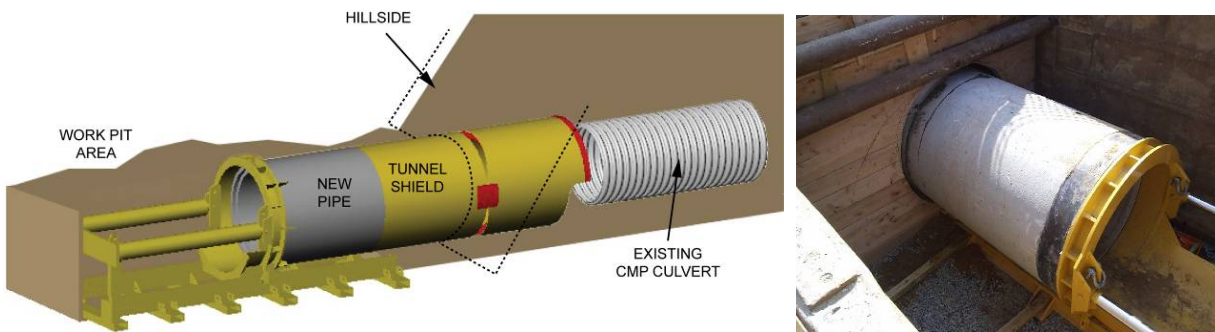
A shield and pipe jacking are used to consume an existing culvert with concrete pipe (Tenbusch, 2009): pipe jacking illustration (left); jacking pipe (right).
